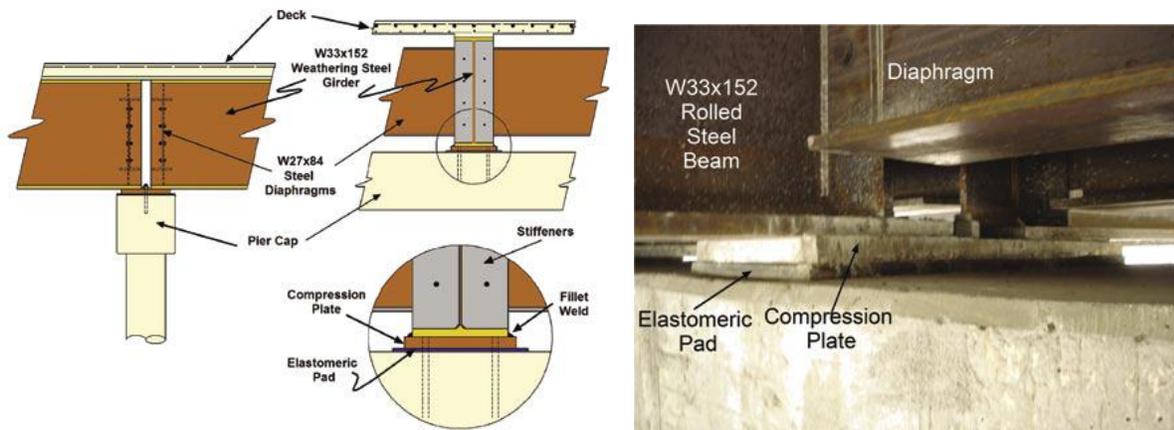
Colorado beam continuity connection above pier cap [16].
